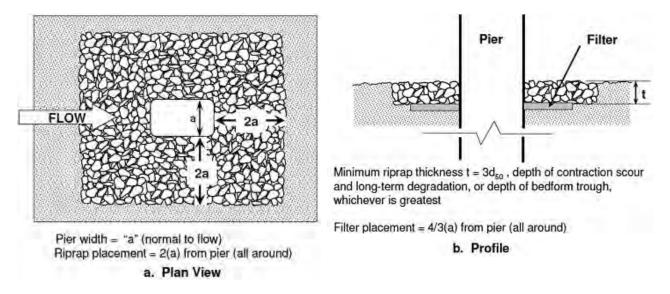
Riprap layout diagram for pier scour protection
